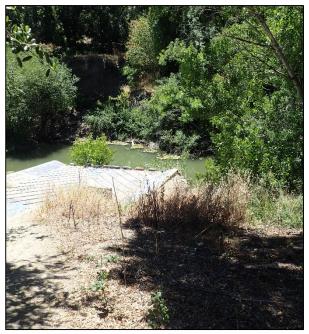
Manmade drainage feature at C-06 next to Arroyo de la Laguna
